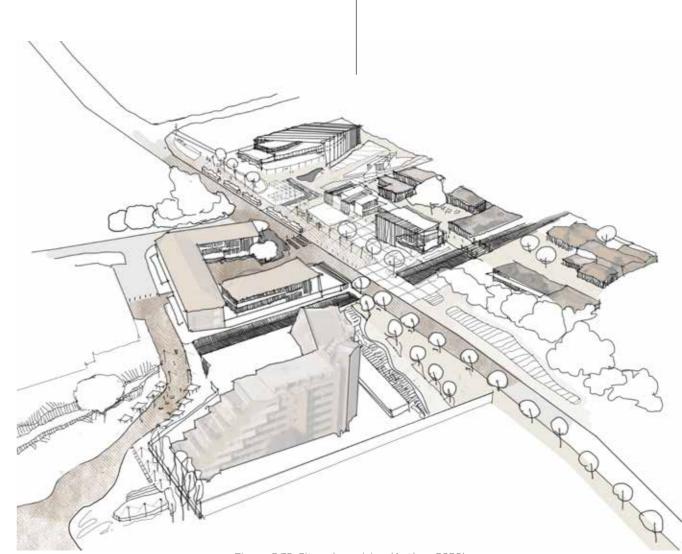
Site urban vision plan iteration and strategies (Author, 2020)
